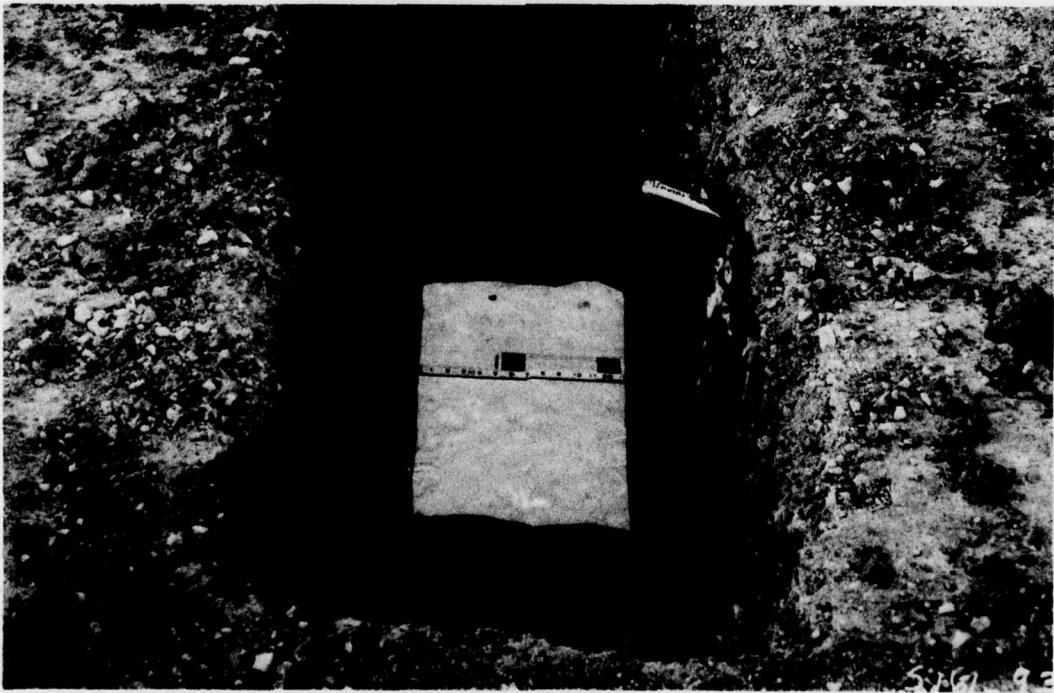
Surface of Styrofoam, Test Section No. 4., item 1, after 480 passes
